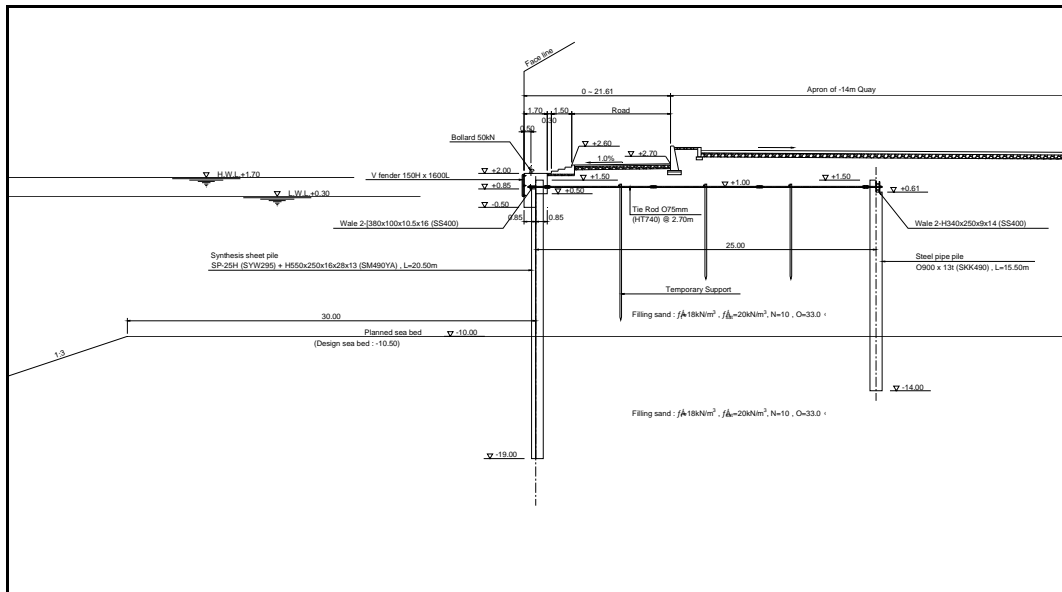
Typical Section of -10m NSQ for Pilot Boat No.1
